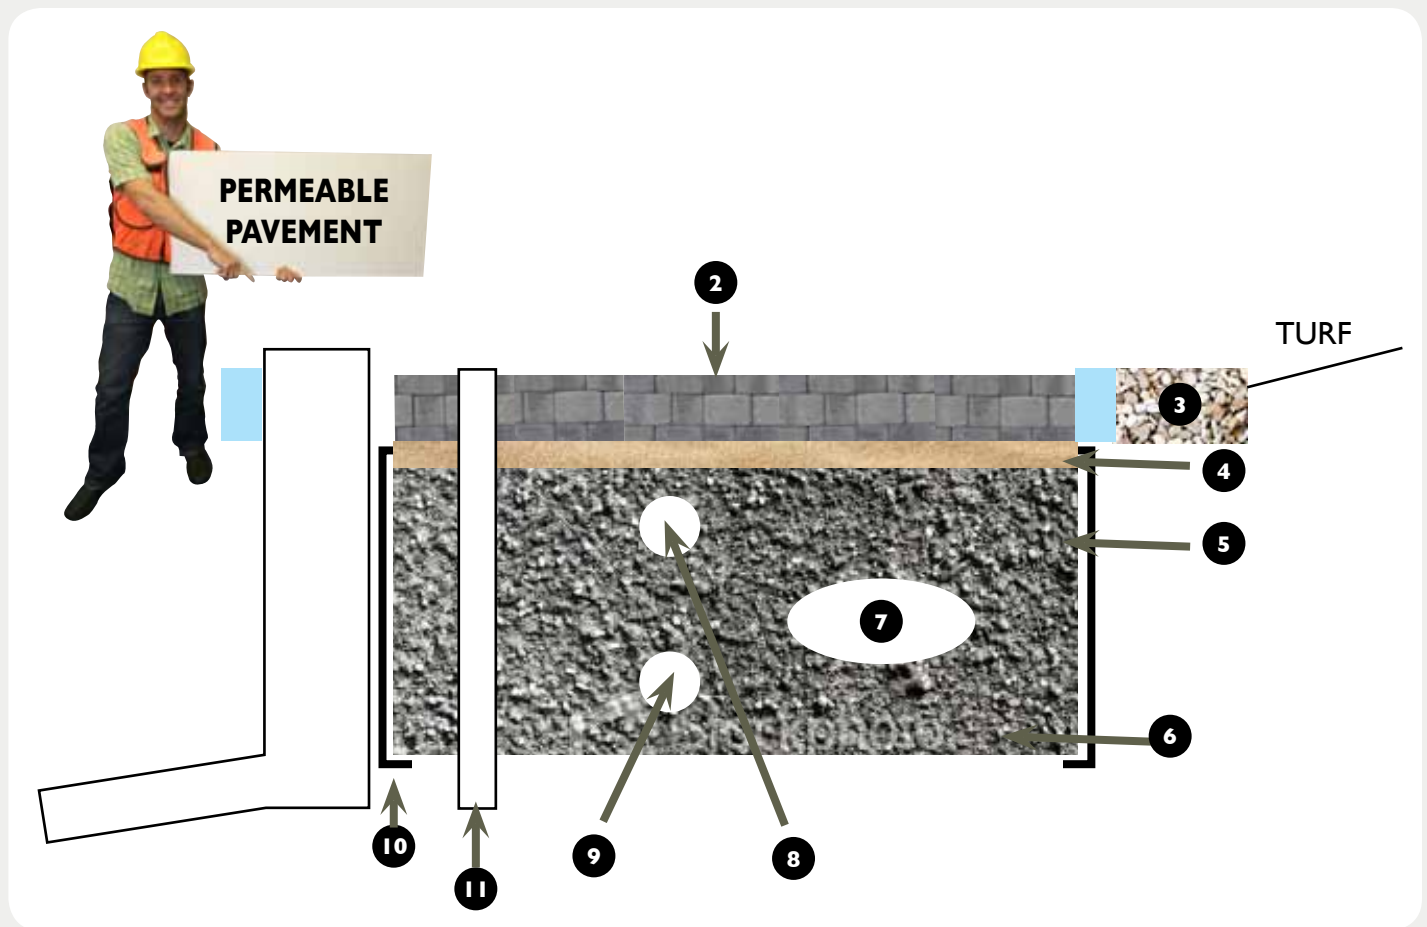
Schematic Profile for Typical Permeable Pavement Section
